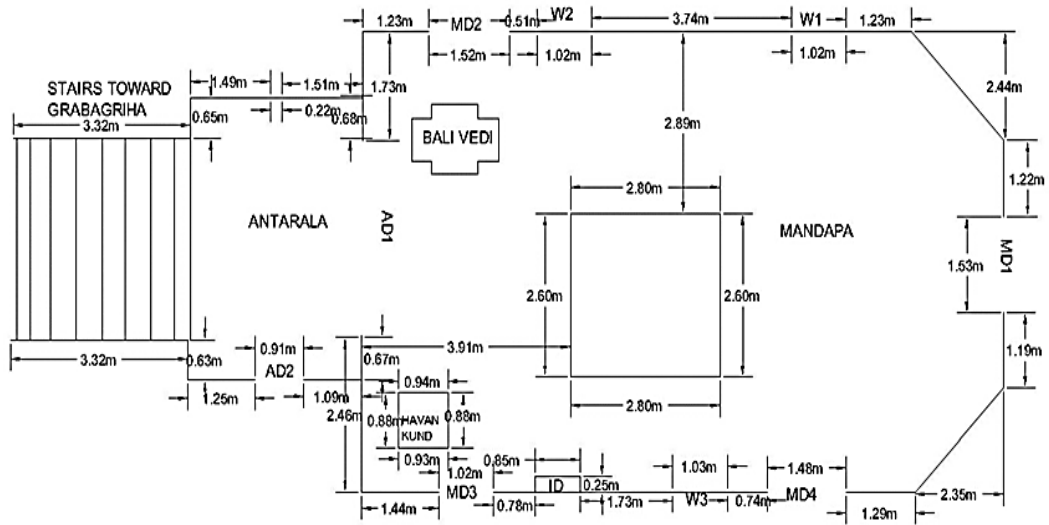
AutoCAD Ground Plan of Kameswara Temple (outer and inner plan)
